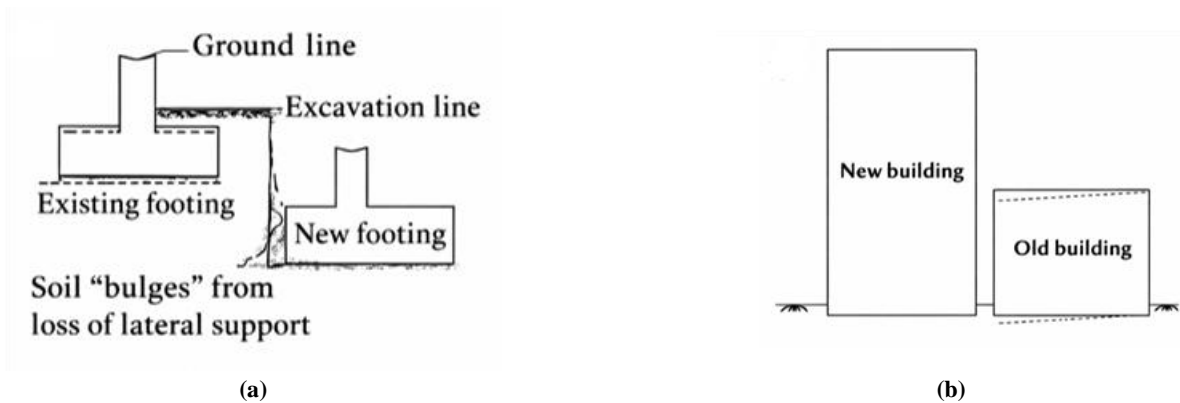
Effect of new foundation construction on the performance of an existing footing: (a) soil failure and lateral displacement due to excavation; (b) non-uniform settlement of the existing foundation induced by adjacent building construction.
